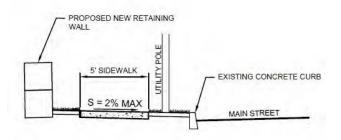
Sidewalk Cross Section Southwest of Taft Street
